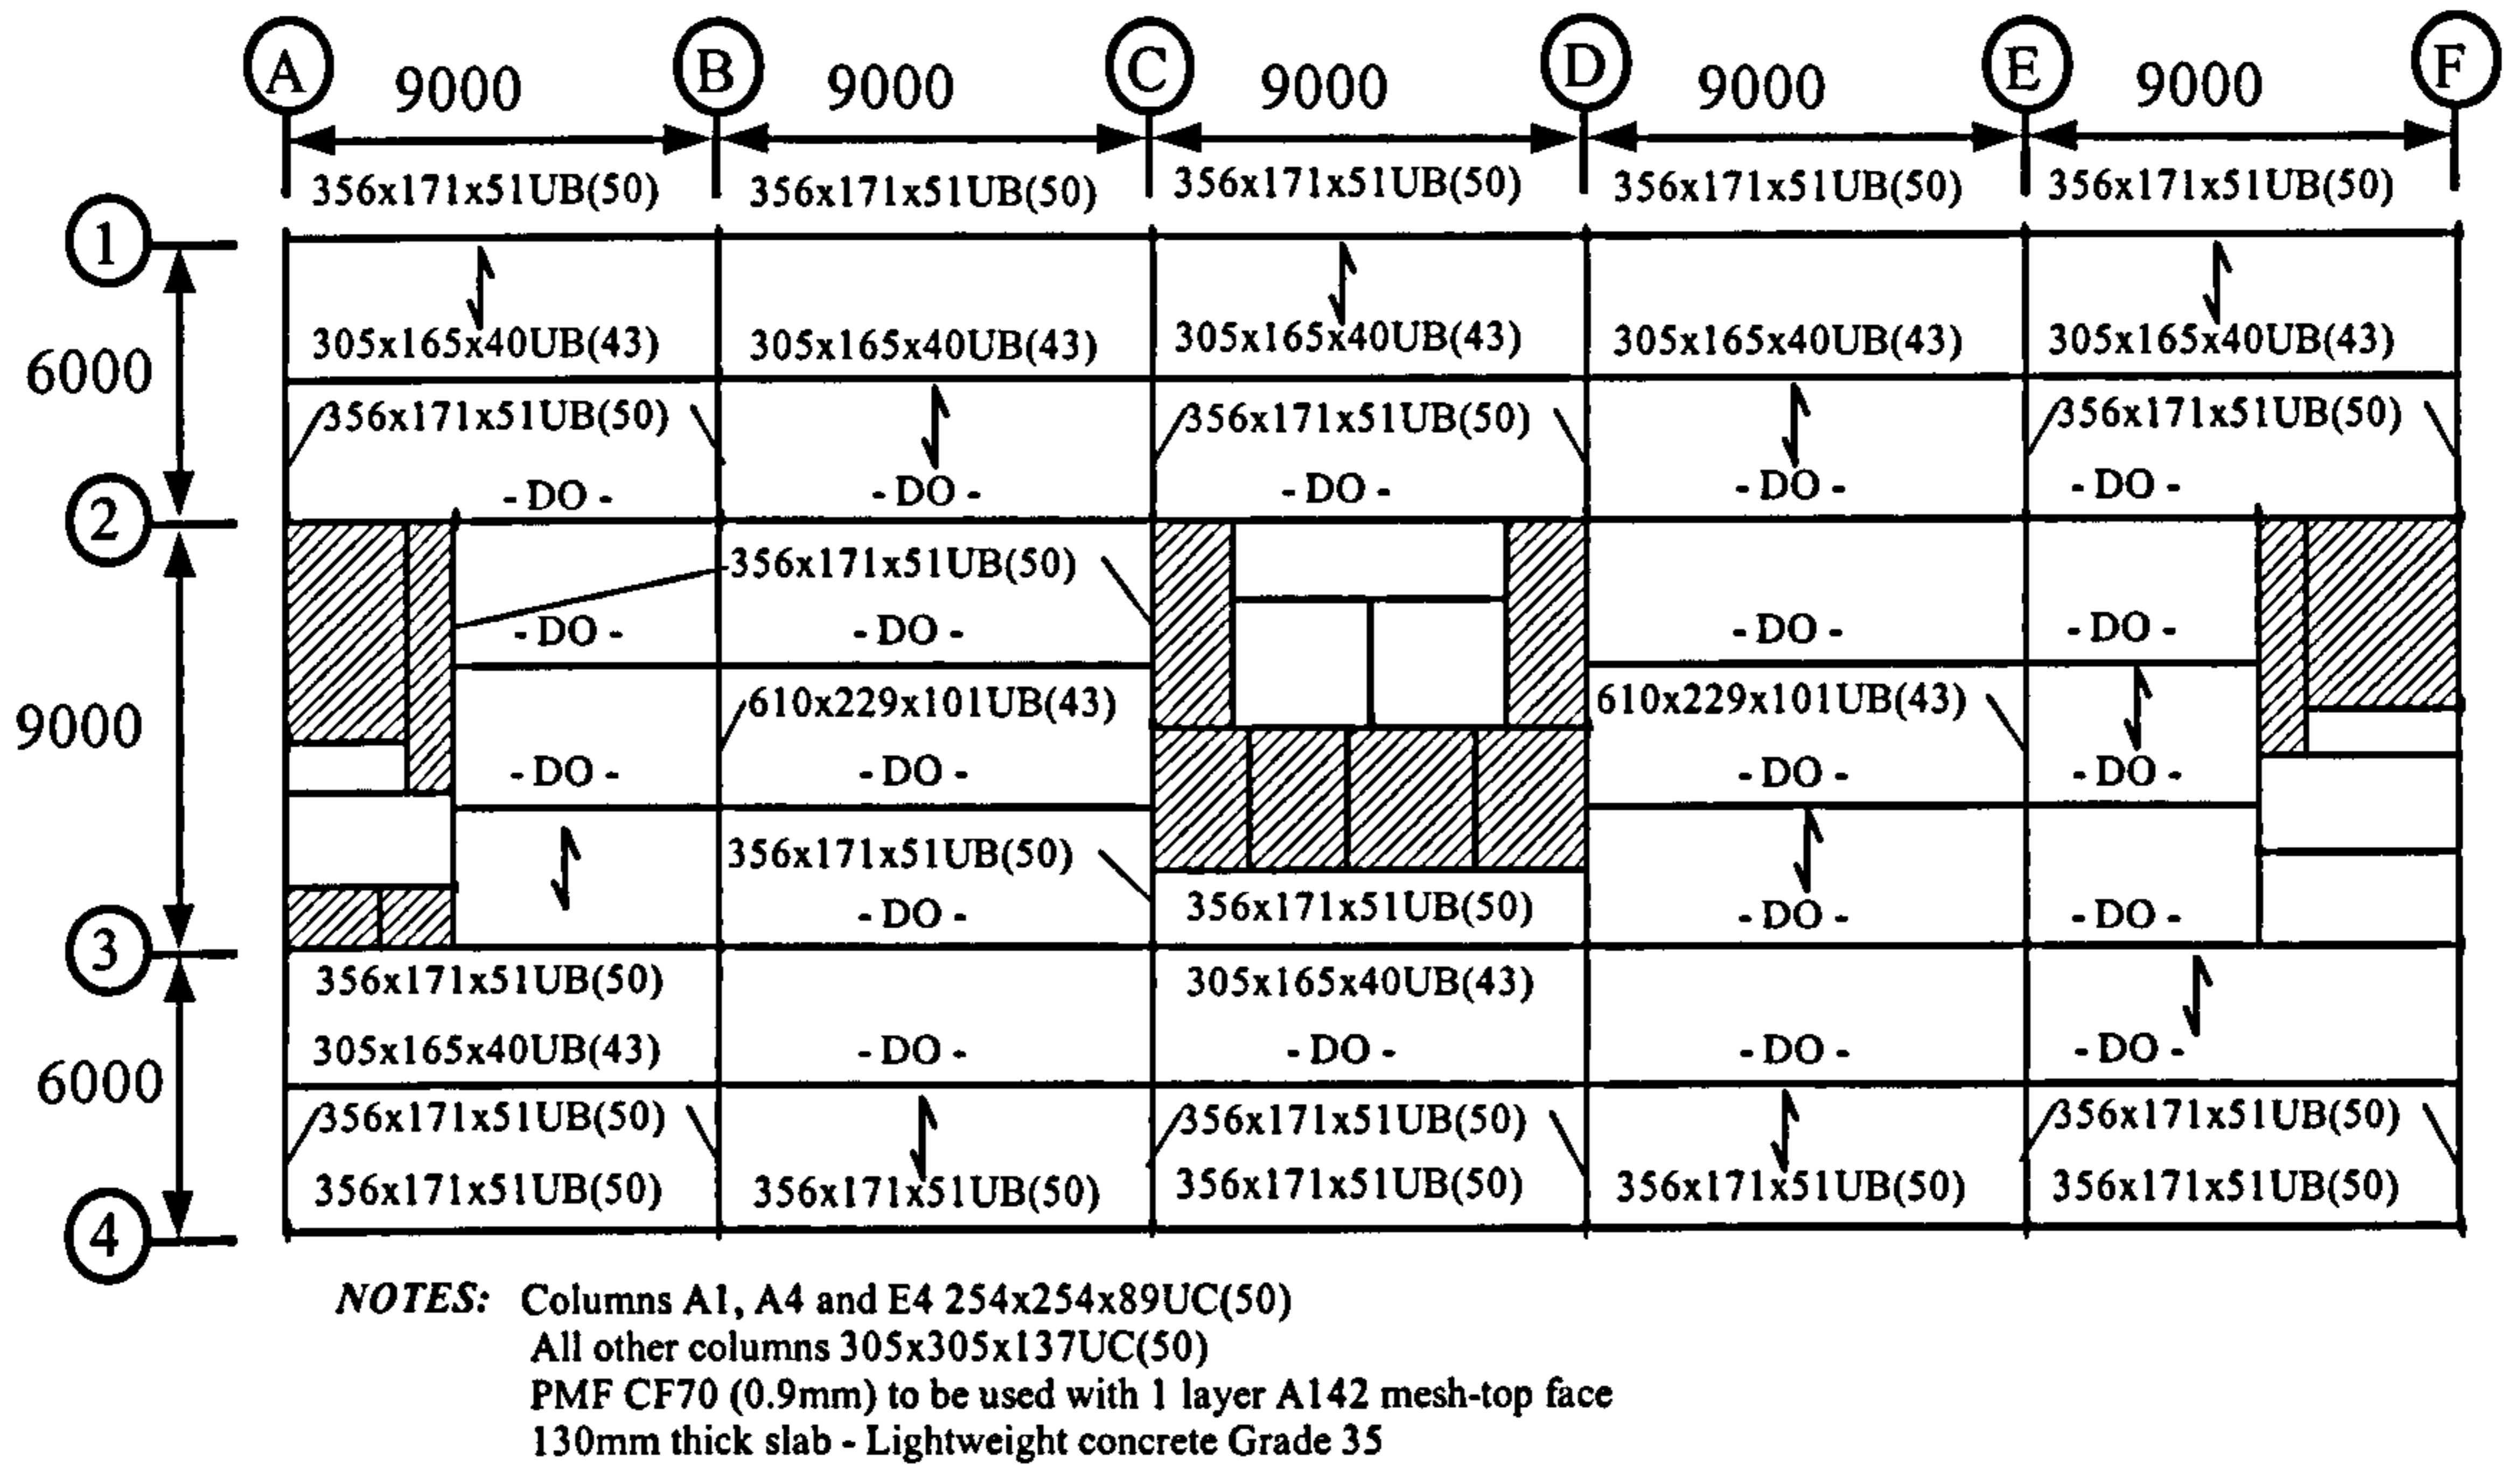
General Beam Framing Arrangement of the Cardington Test Frame
